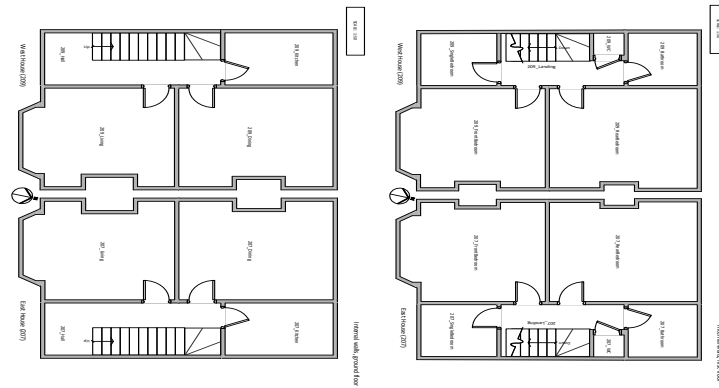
(Left): Ground Floor plan; (Right): First Floor plan
